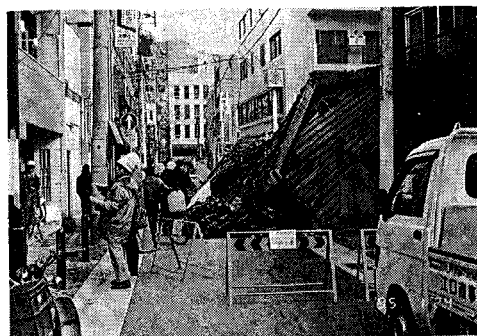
Collapse of wood houses roofed with heavy ceramic tiles
